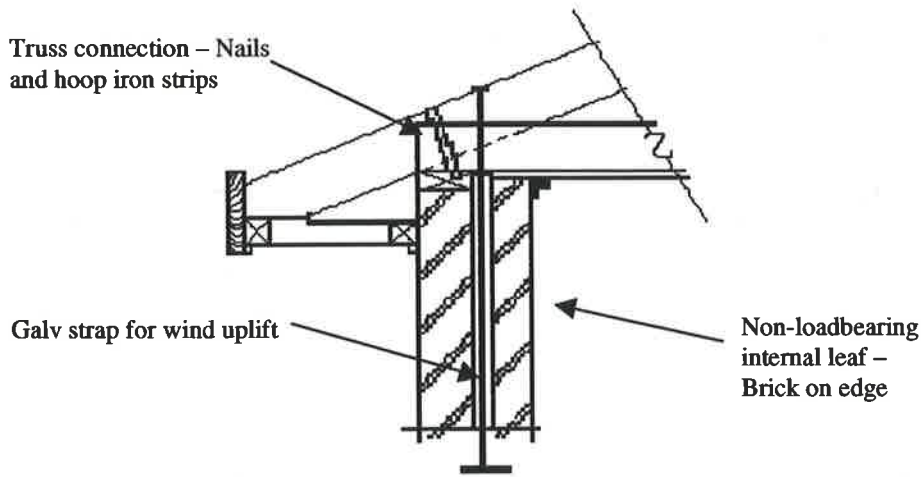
URM Cavity Wall to Roof Truss Connection Detail (Outer Loadbearing)
